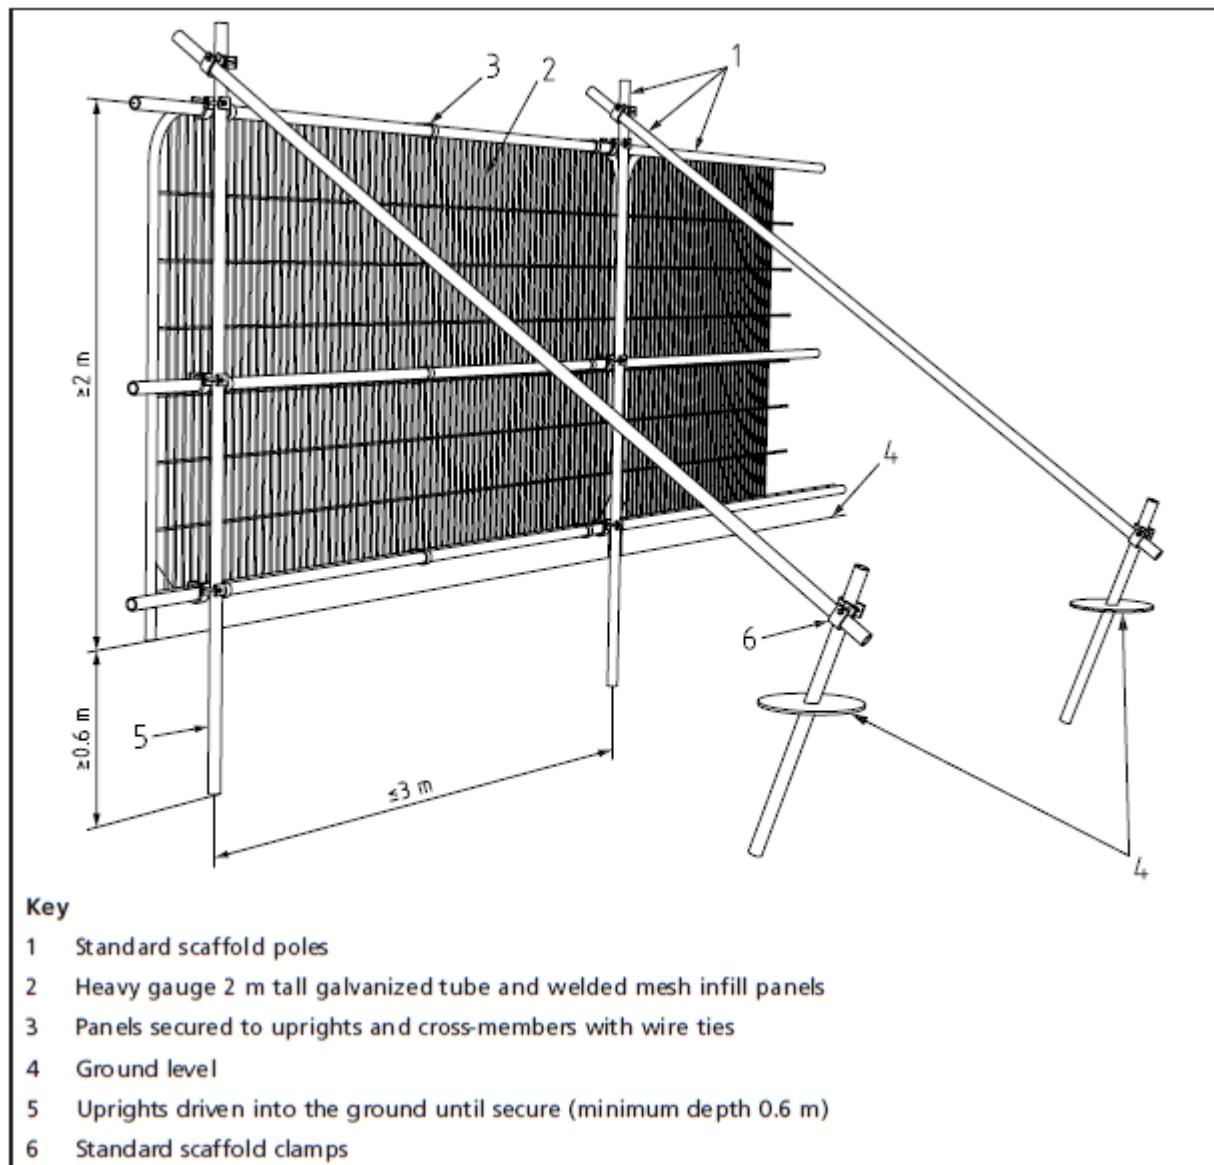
Tree Protective fencing specification (adapted from BS5837:2012, p.20).
